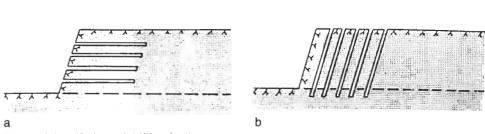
a) Horizontal drilling for the bench and b) vertical drilling for the bench.
